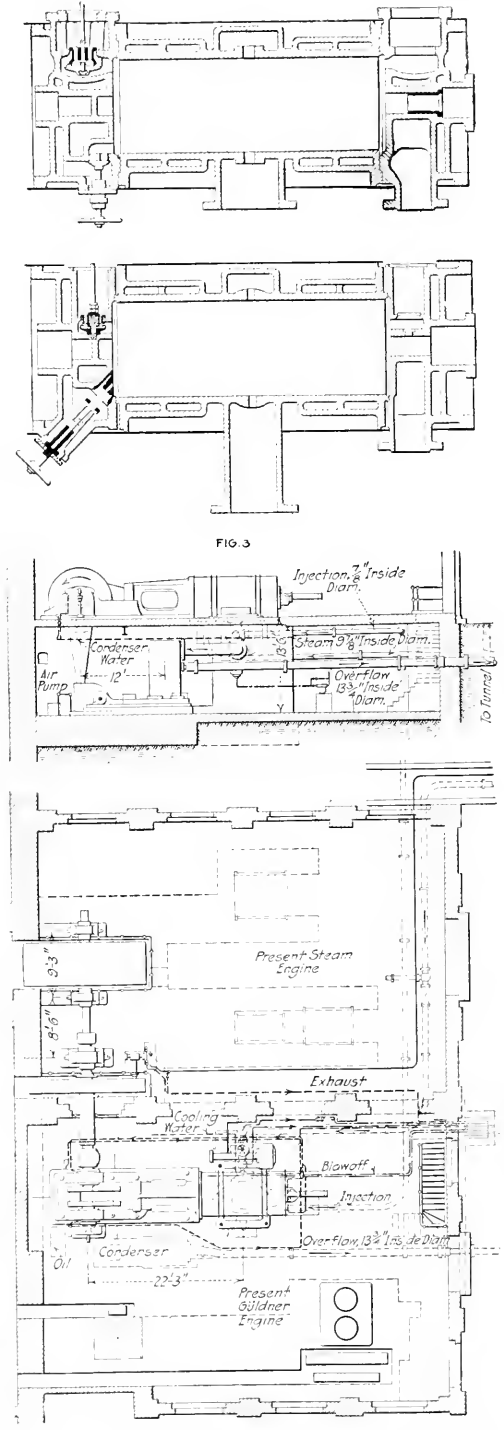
PLAN AND ELEVATION OF 2000-HP. INSTALLATION
